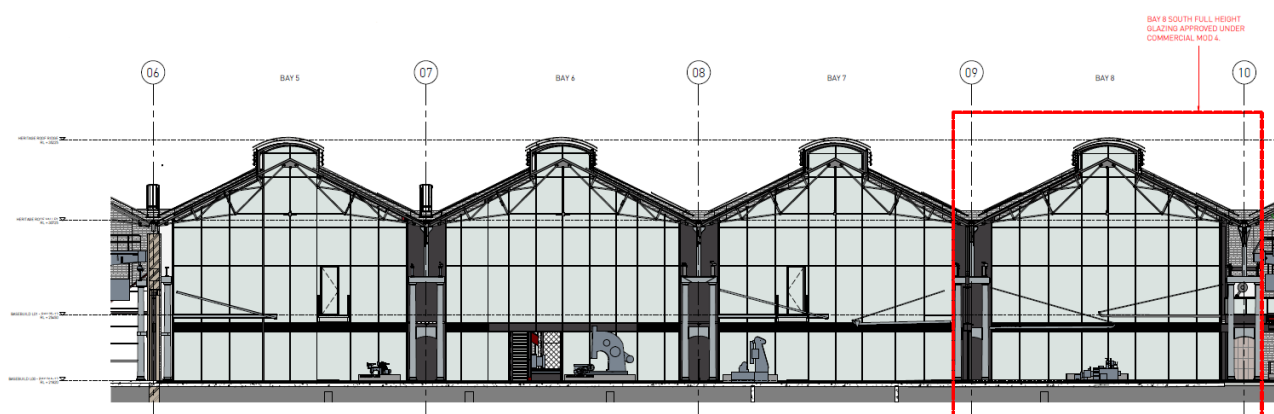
Full Height Glazing Elevation – Bay 5-8 South
